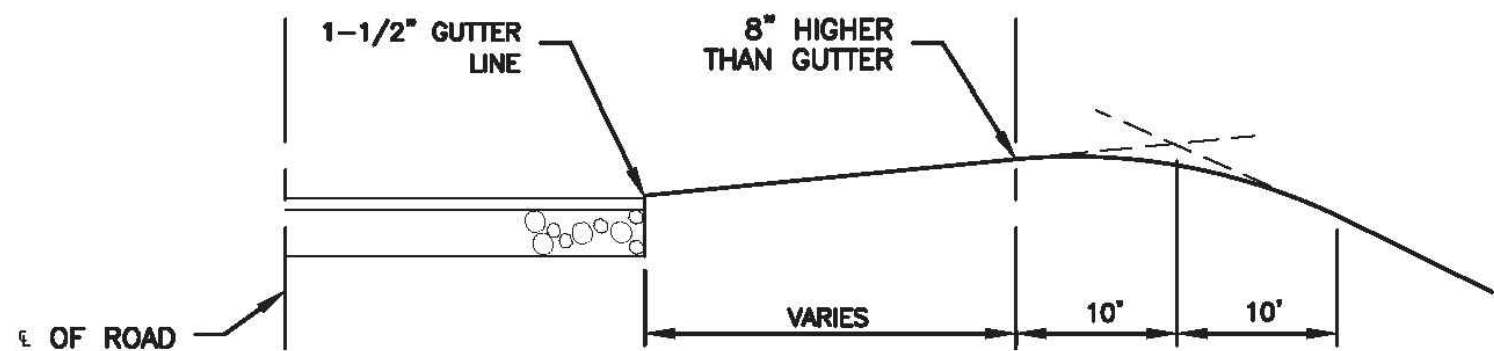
DETAIL PROVIDED BY THE CONNECTICUT DEPARTMENT OF TRANSPORTATION
